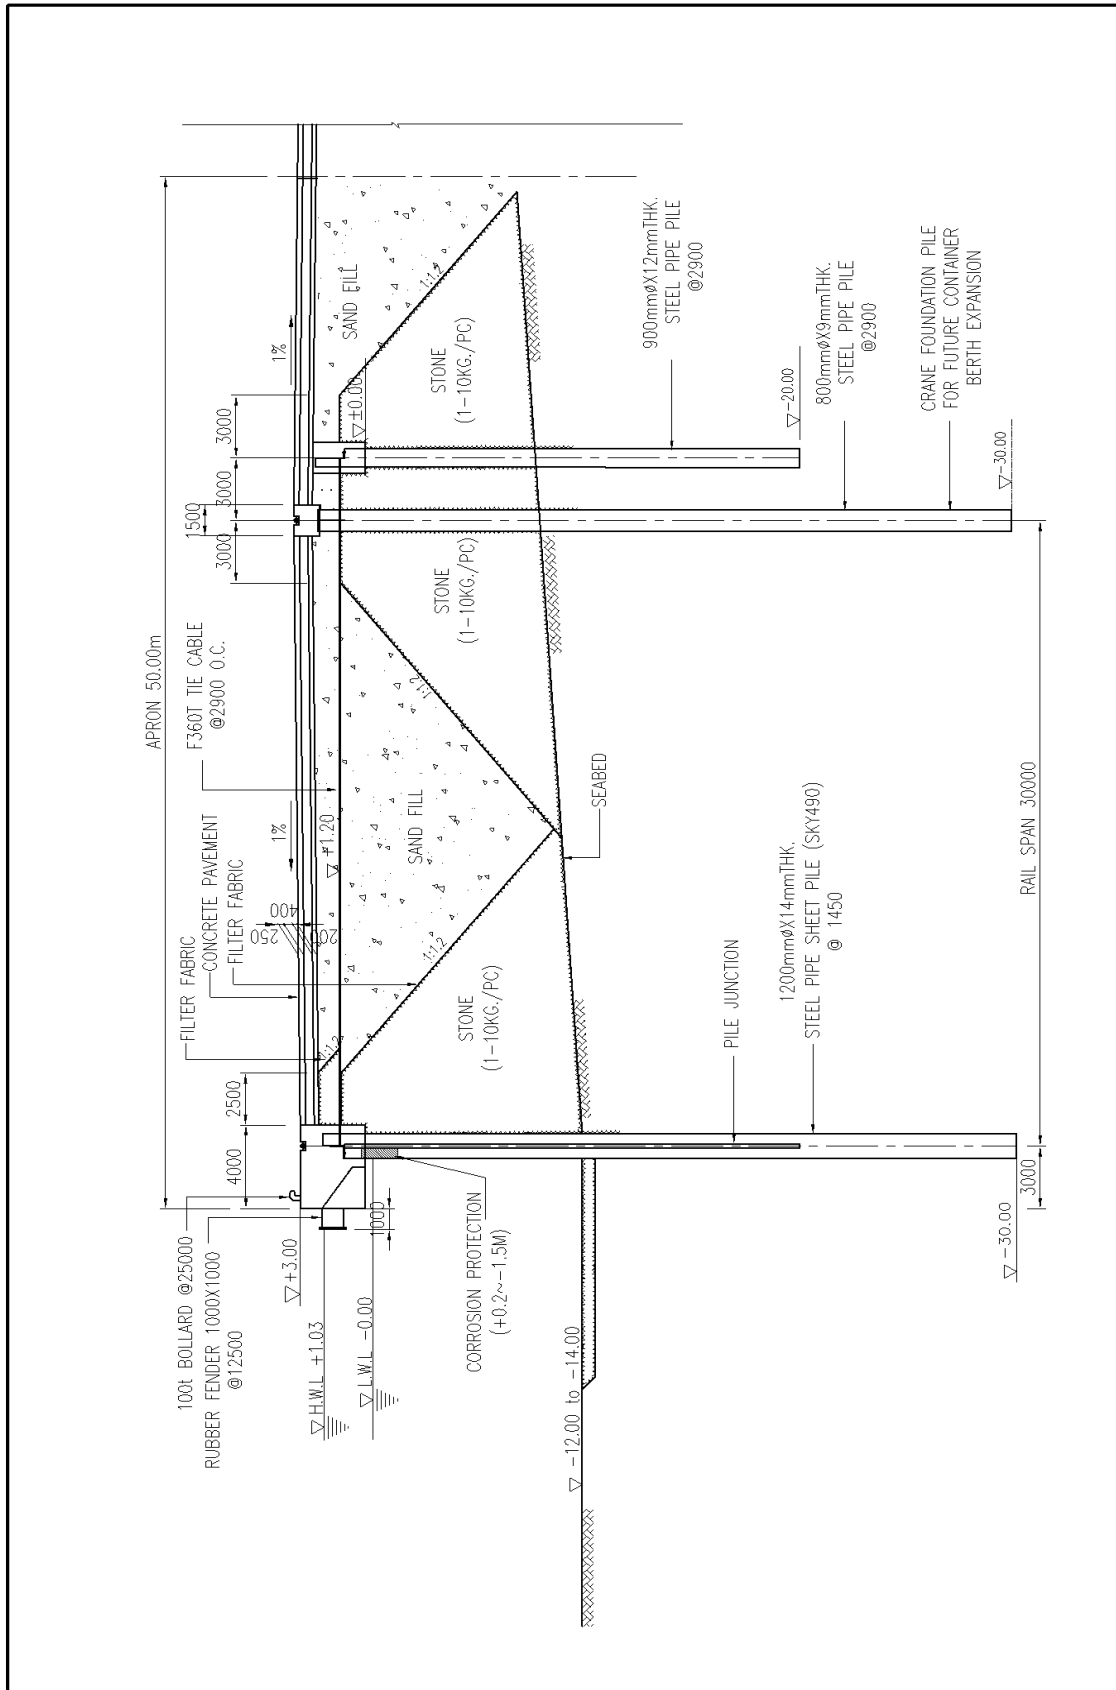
F-8 Steel Pipe Sheet Pile (SPSP) Type Quaywall
